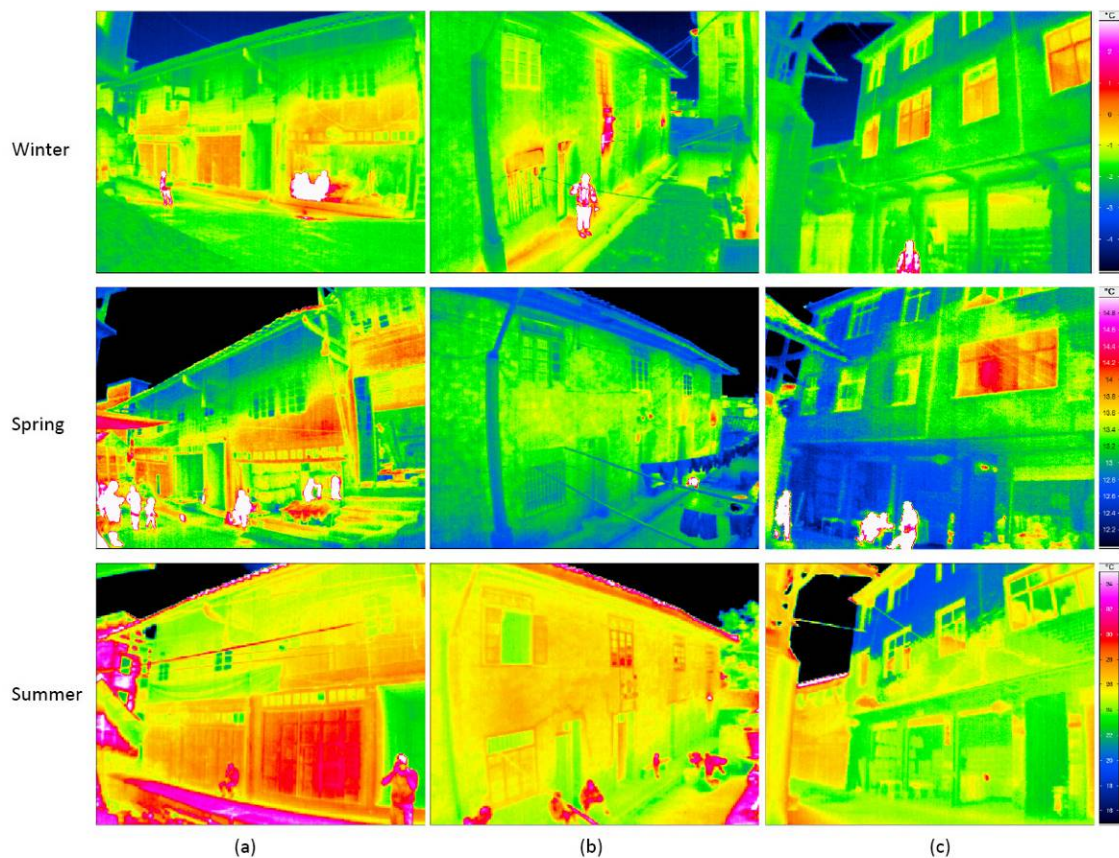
Seasonal differences. (a) is the building with wooden walls; (b) is the building with stone walls; (c) is the building with tiled cement brick walls
